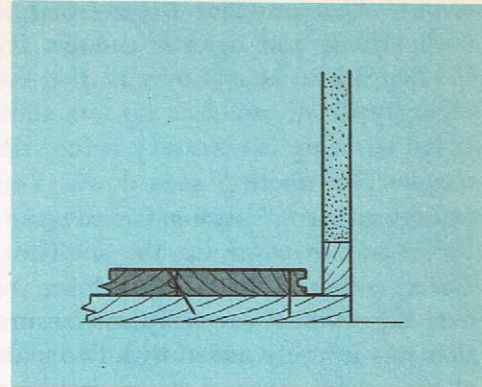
How the first strip of flooring should be nailed down. Note that this strip does not come up against the wall but is kept a fraction of an inch away. This is to prevent the floor from buckling should the wood expand.
